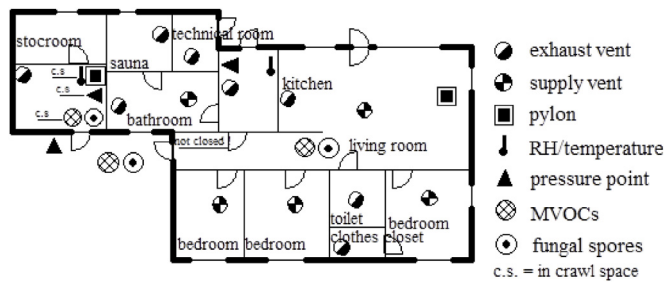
Floor plan and sampling points of the crawl space in the studied building.
